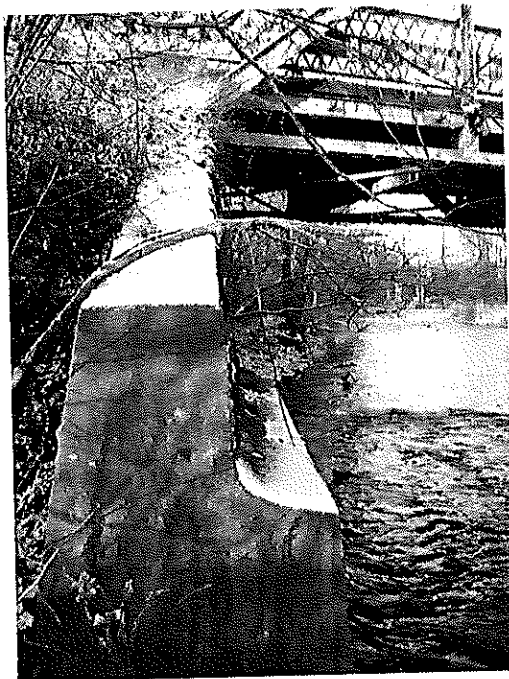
Abutment and Wing Wall on the West Side of Collingwood Street Bridge on the North Bank
